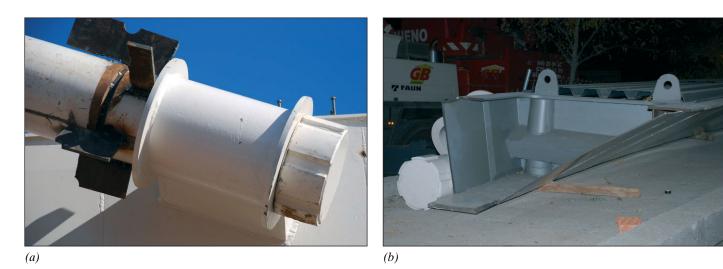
Upper chord to girder connection. (a) General view during erection. (b) Diaphragm inside the box girder
